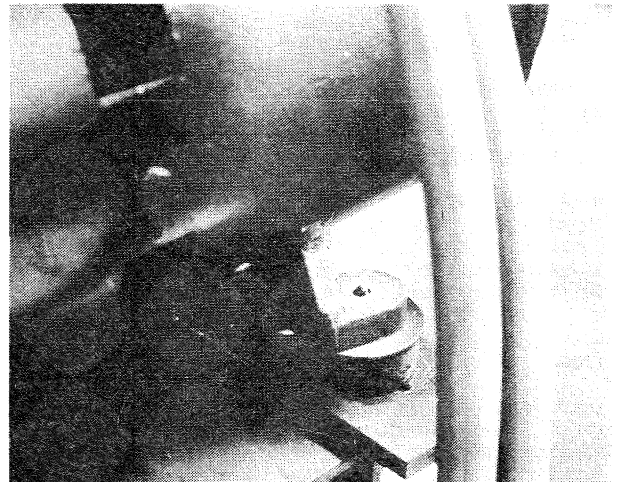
BoP Power Board Building lift motor foot showing lack of holding down
